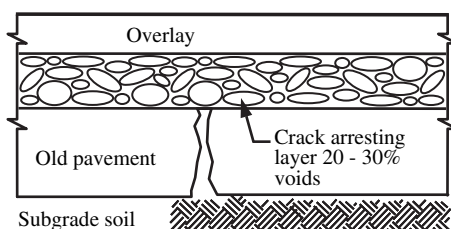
Cross section of a typical crack-arresting interlayer.
